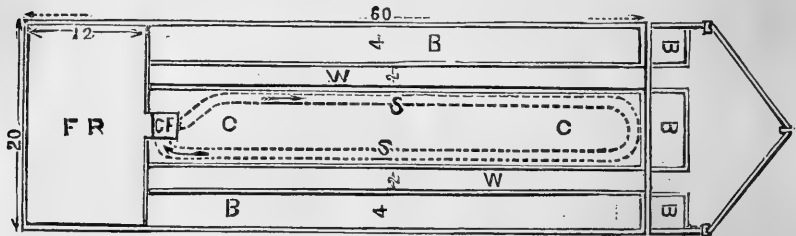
PLAN OF A SINGLE HOUSE—60×20 ft.
